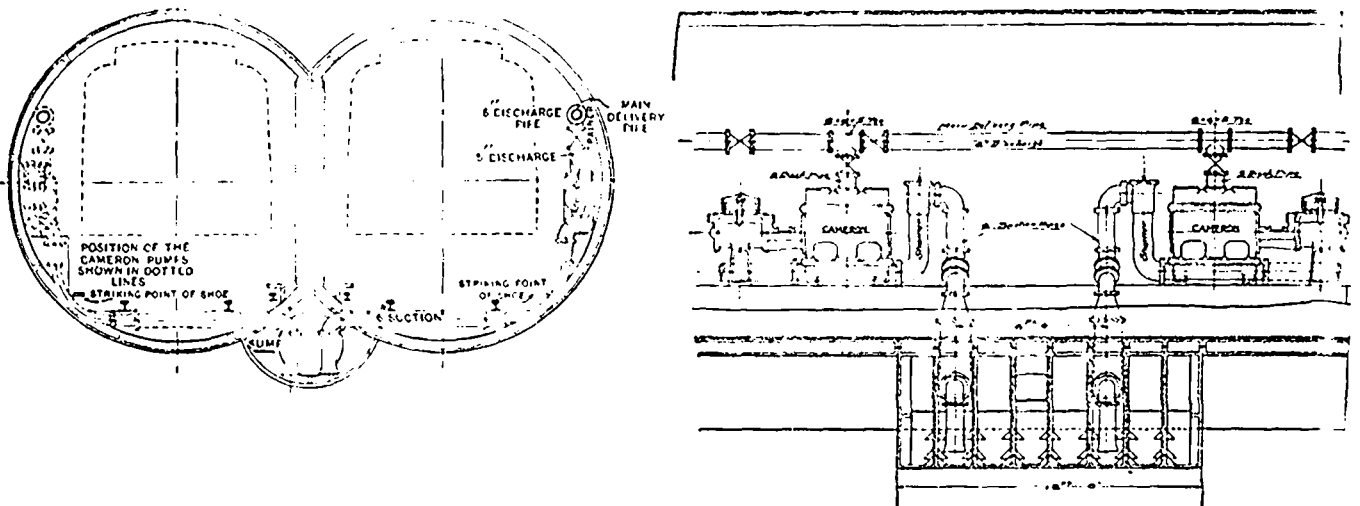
SECTIONAL VIEW OF TUNNEL.
